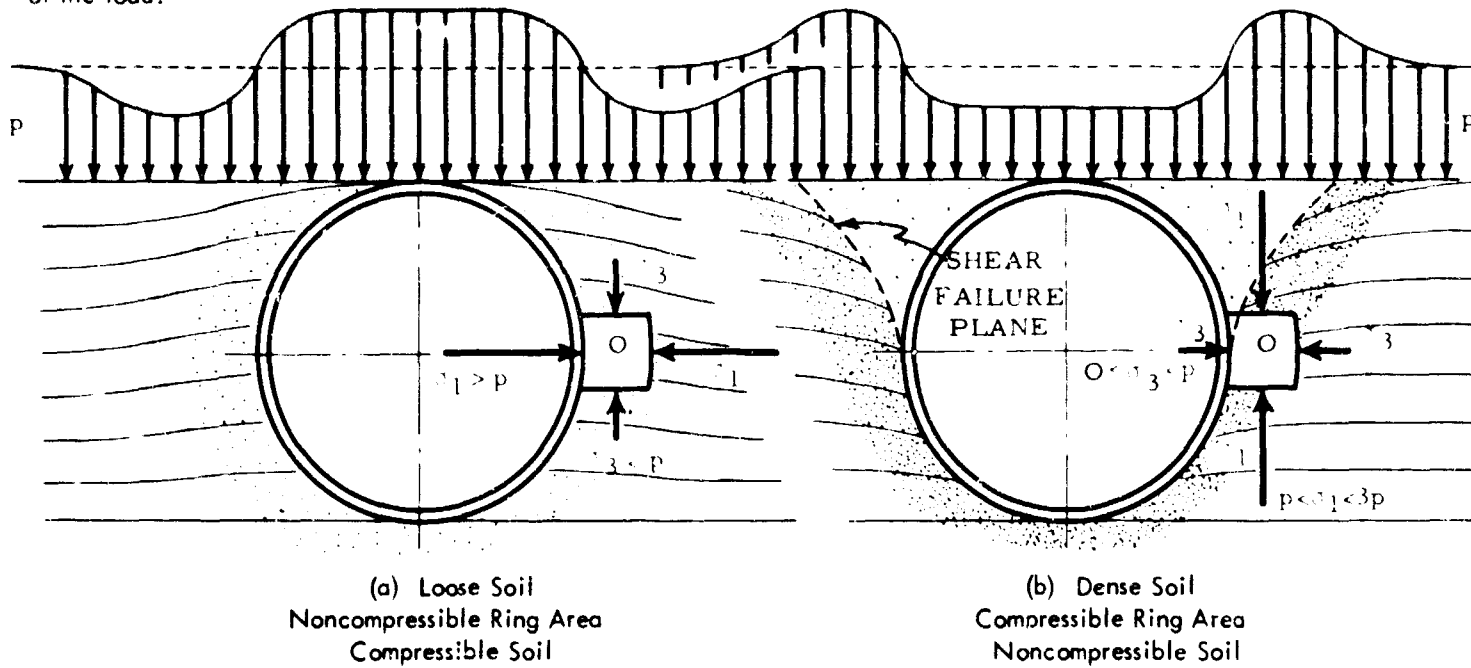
Soil Stress Element at Spring Point of Flexible Buried Conduit
